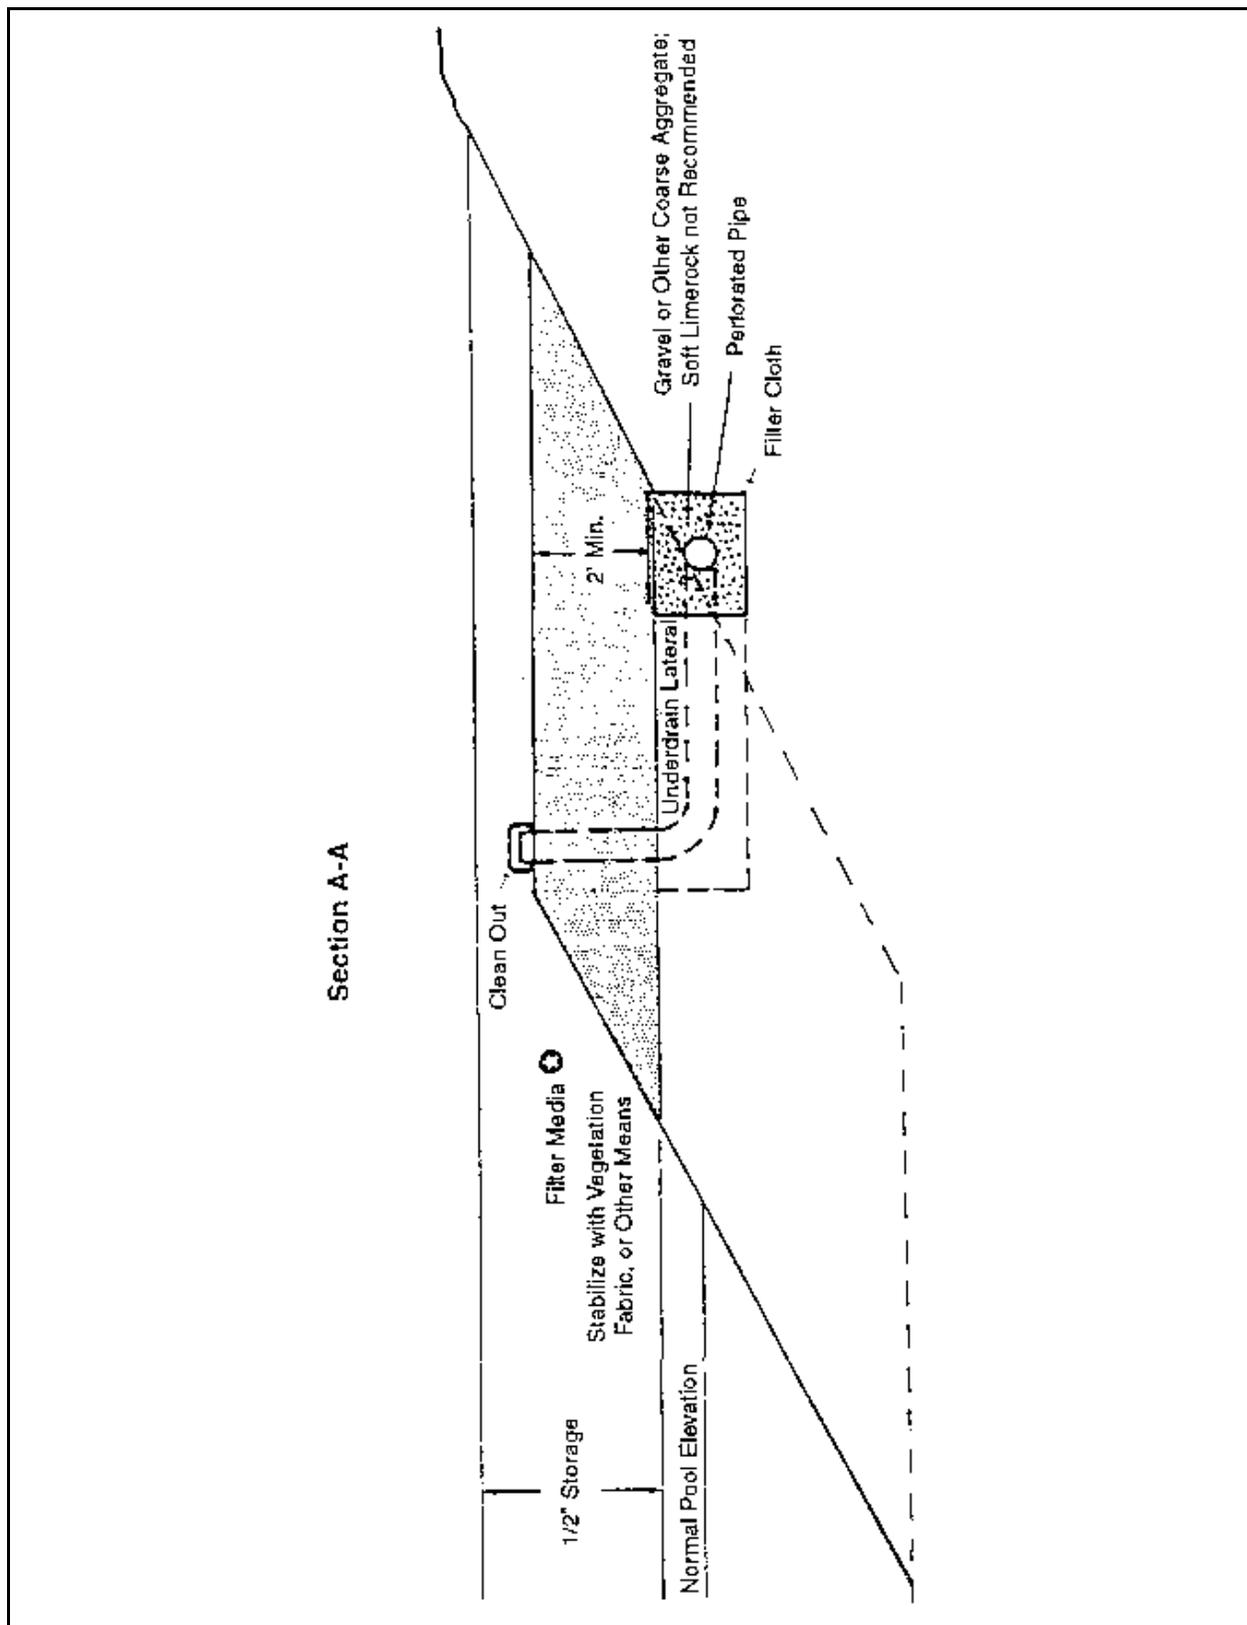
Typical Cross-Section of Elevated Bank Filtration Bed used in Conjunction with Wet Stormwater Detention Facilities
